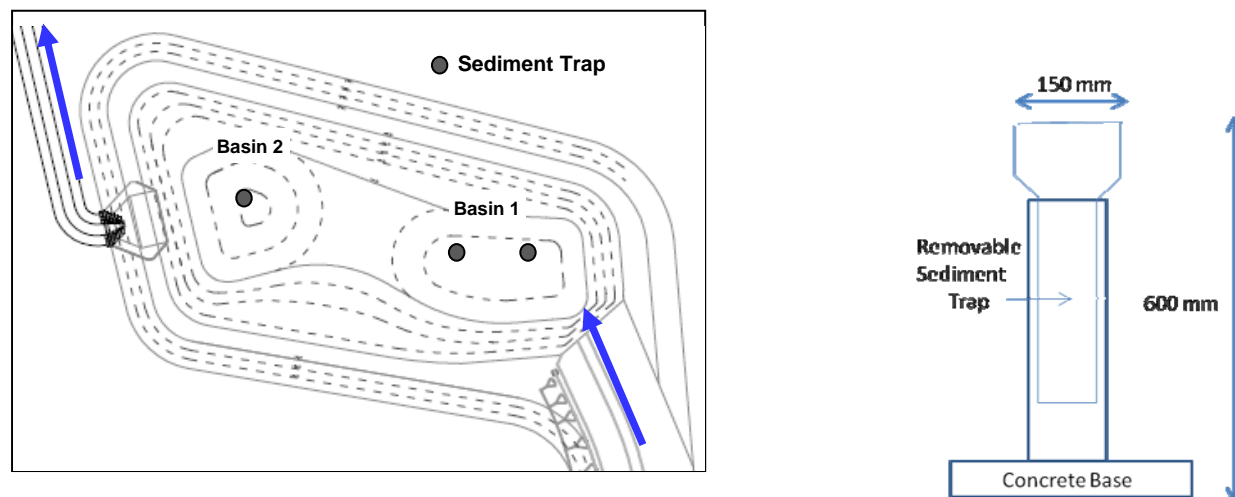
i) Plan of Balancing Pond and ii) Sediment Trap Design
